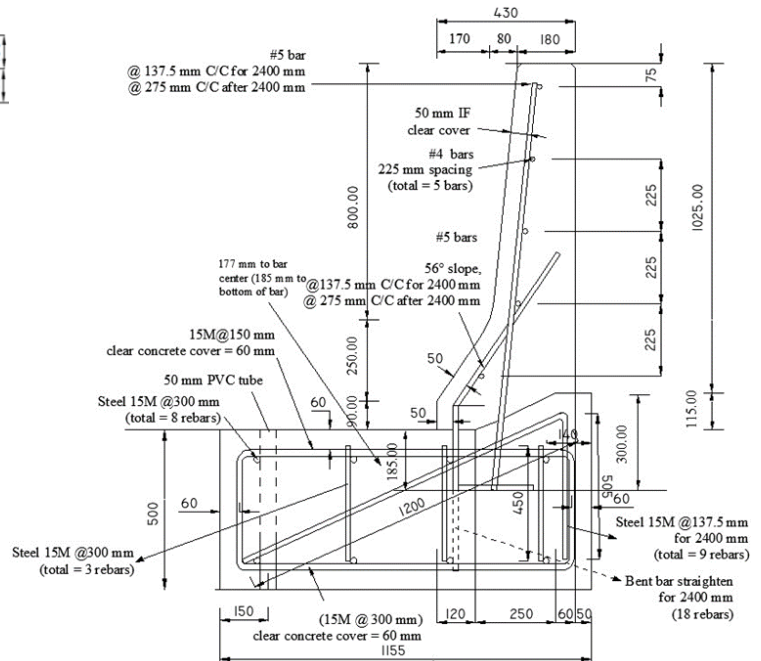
Specimen S2-FRC10 dimensions and reinforcement details (units in mm)
